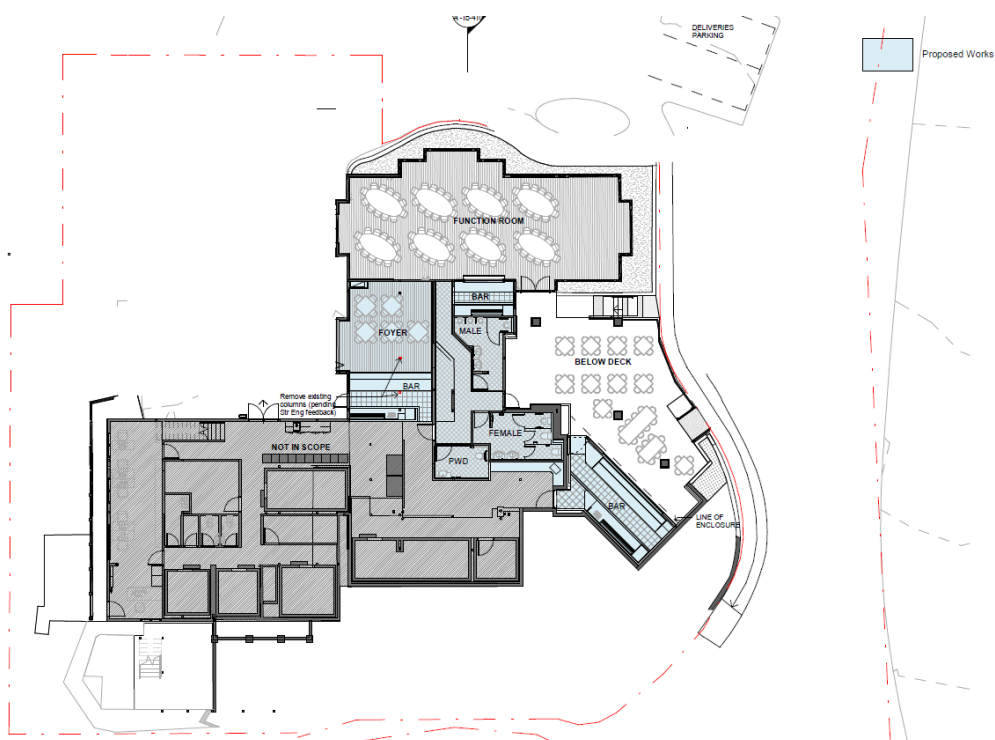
Proposed Kiosk Ground Floor Fitout (Hogg and Lamb, 2026)
